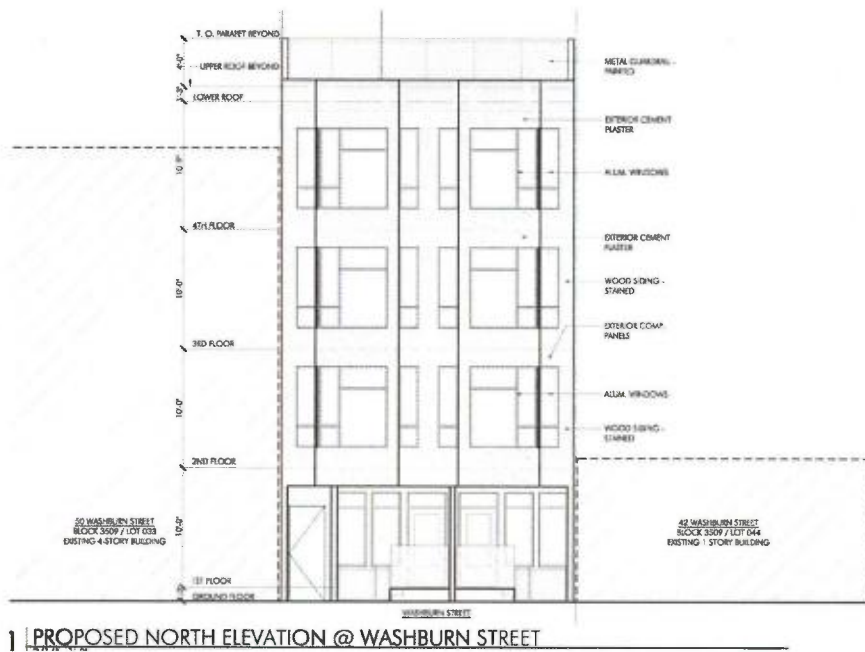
17 Grace Street Proposed North (Washburn Street) Elevation
